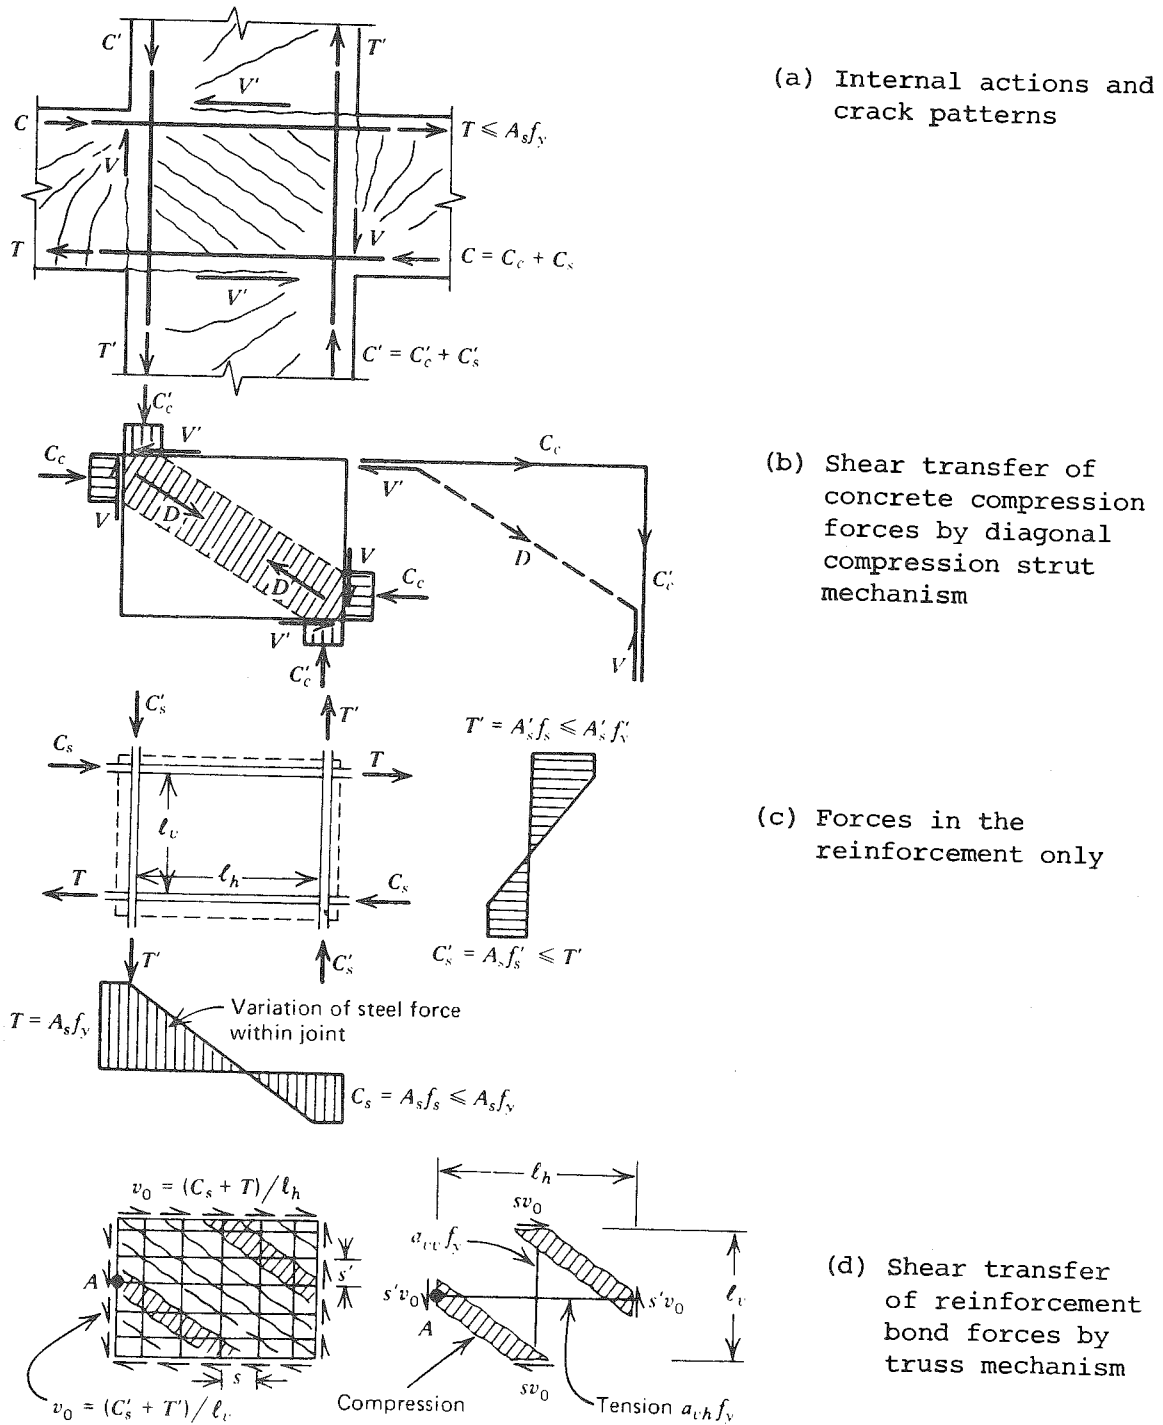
Idealised Behaviour of Reinforced Concrete Beam-Column Joint of Frame Subjected to Horizontal Loading [3].
